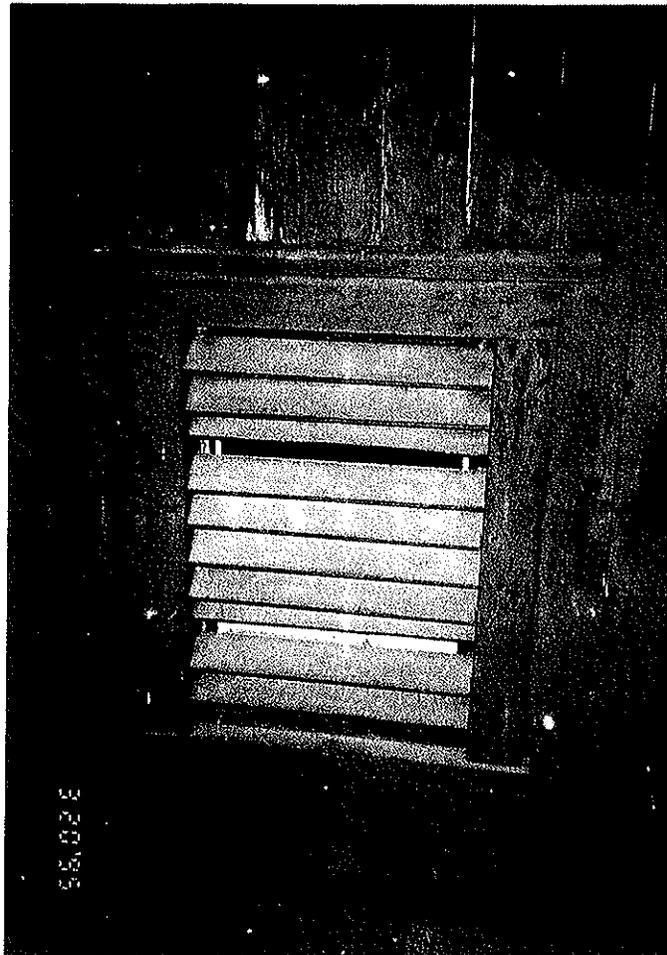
Weir Studio - Water Tank Room [Room 301], North Wall, Louvered Window W303 (1995).
